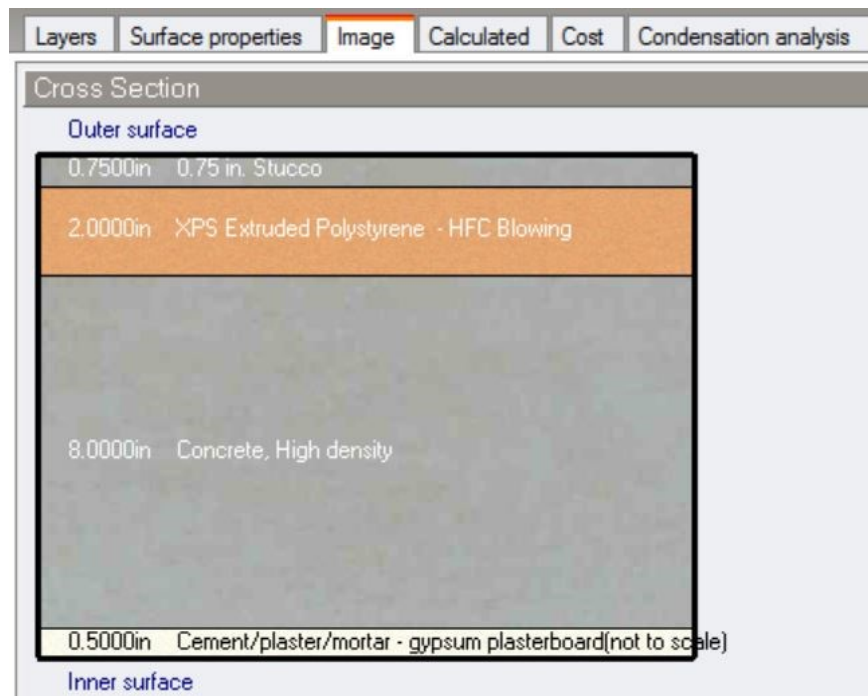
IRC recommended heavy mass construction external wall, cross section
